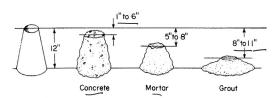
Slump test comparison of concrete, mortar, and masonry grout.
